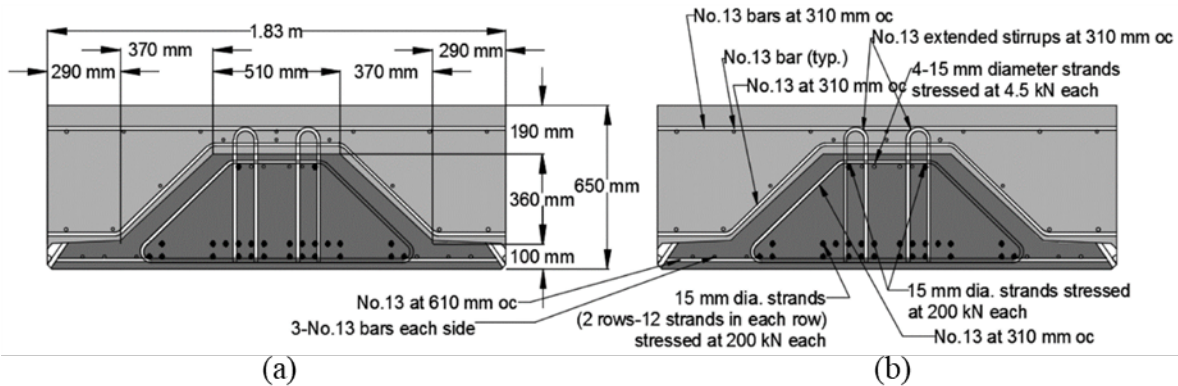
(a) Typical composite cross-section and (b) typical reinforcing details [15]
